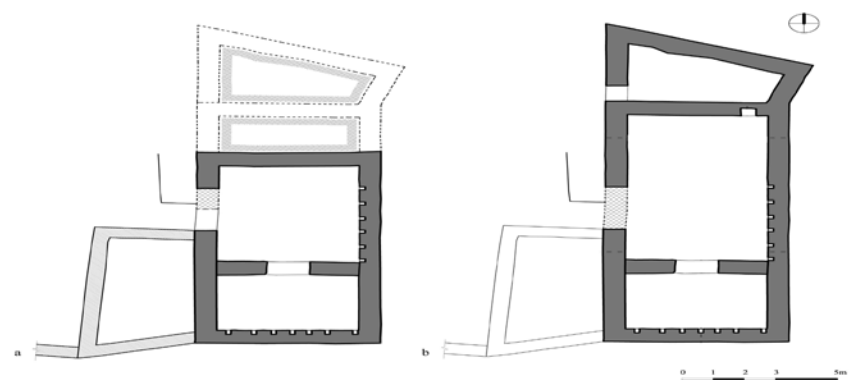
Plans of the dwelling no.1 a) Ground floor. b) First Floor
